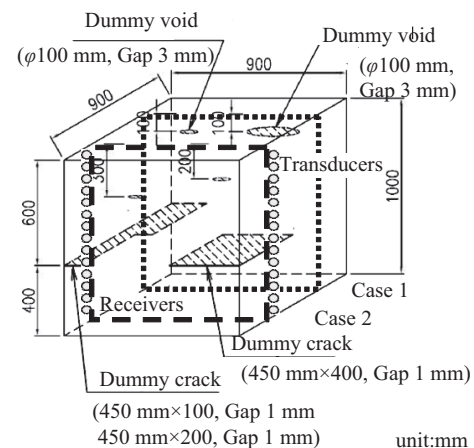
Layout of dummy voids and cracks of concrete specimen
